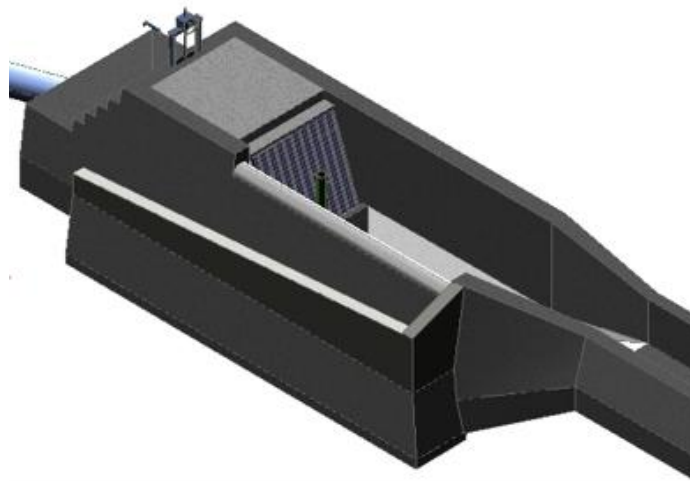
Schematic overview of a typical forebay tank showing spillway, trash rack and penstock.
